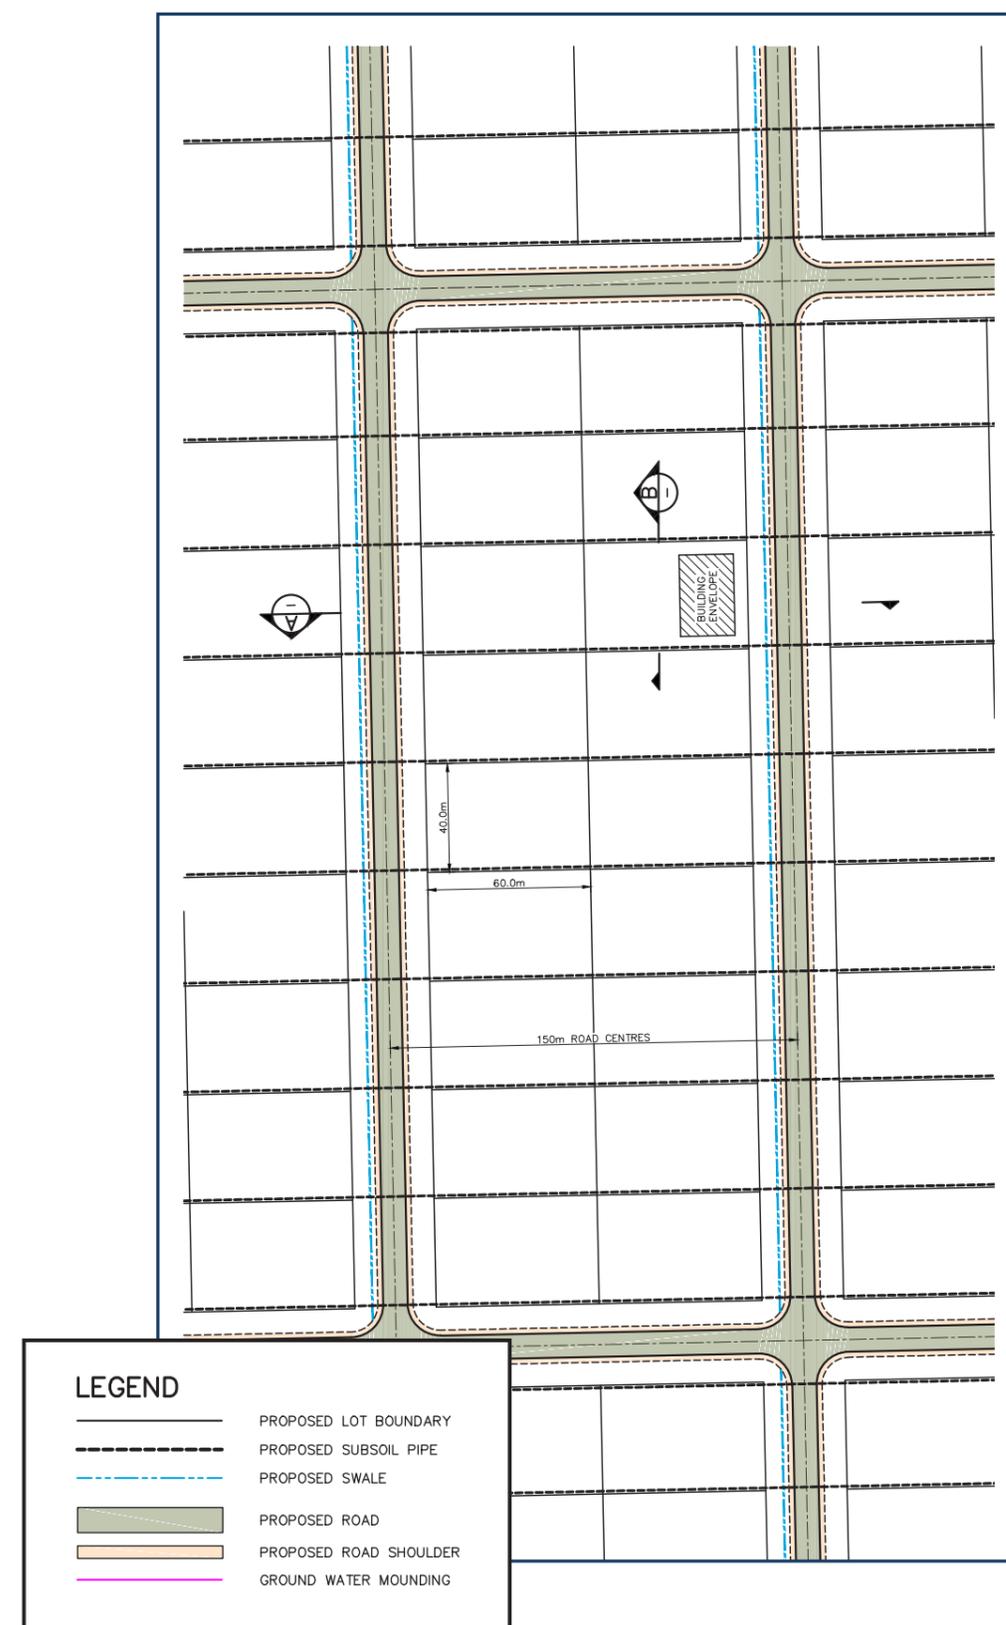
Typical Subsoil Detail for Industrial Lots - Plan View
